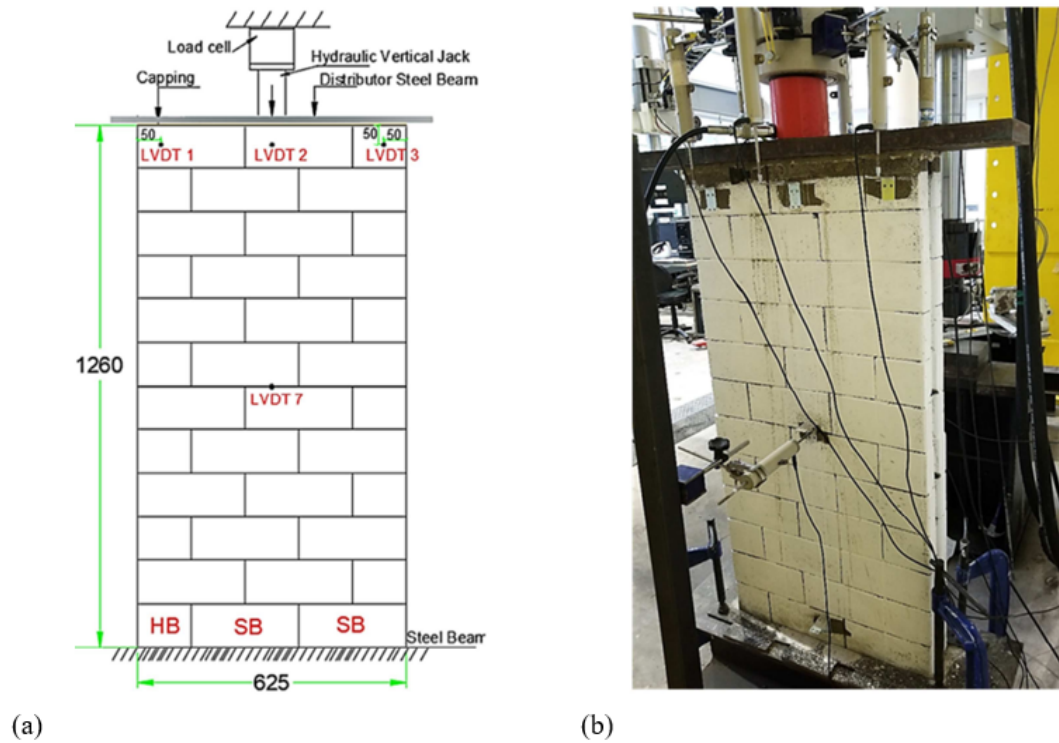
Interlocking Masonry wall test setup and instrumentations (Unit: mm) a) elevation view and b) instrumentation and test set up [10].
